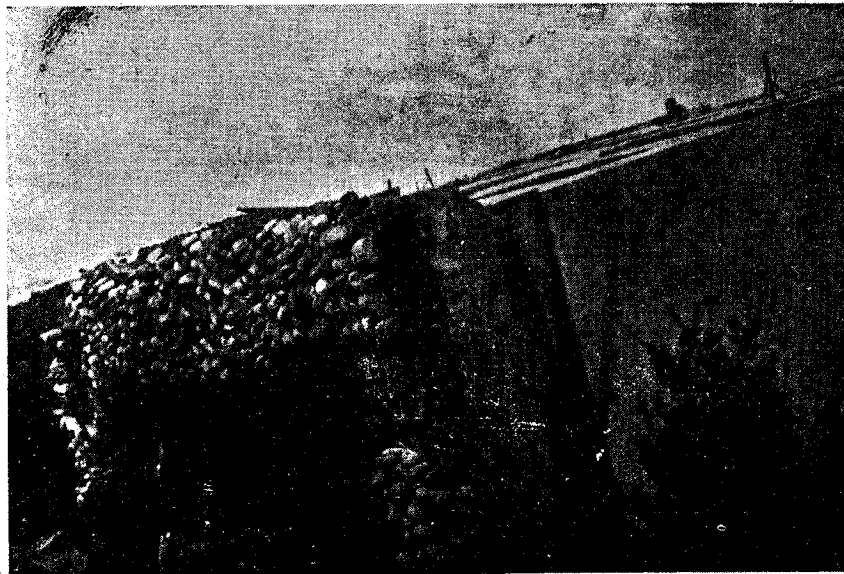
Overturned Apartment at Niigata Showing the Foundation Stones
